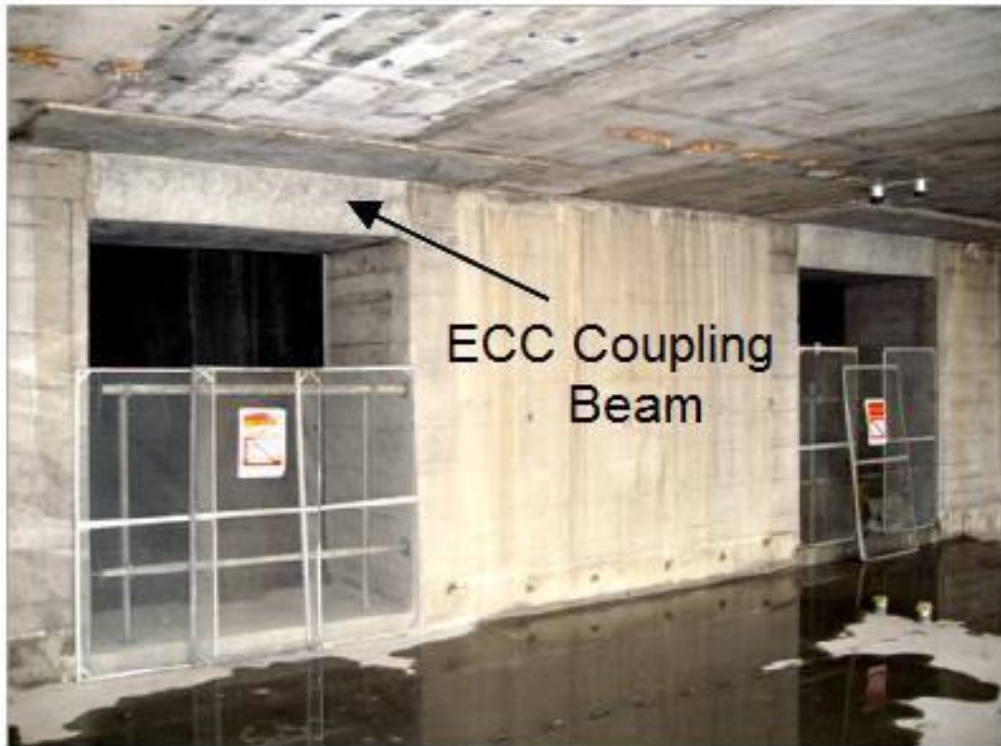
Beams Made of ECC Concrete Were Used in a Structural Building in Japan (T.Kanda et al, 2011)
